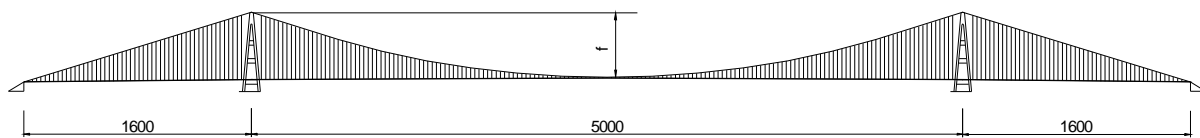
Elevation of the 5,000m long suspension bridge (Unit: m)
